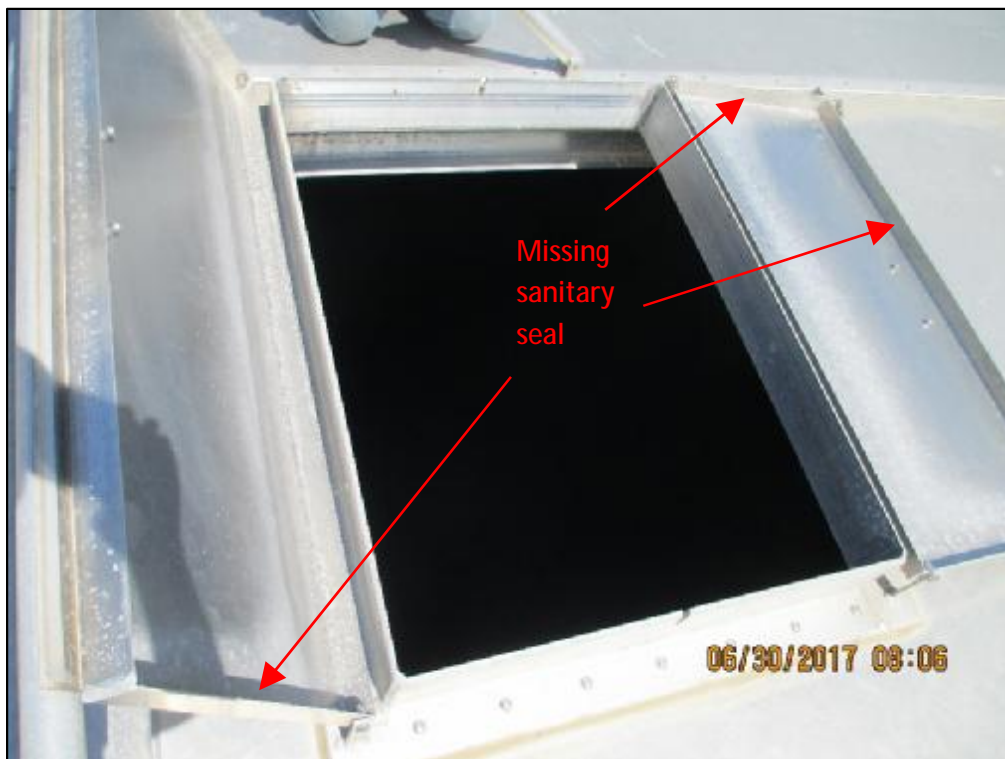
The concrete roof and the metal roof need a seal at Reservoir 52698.
